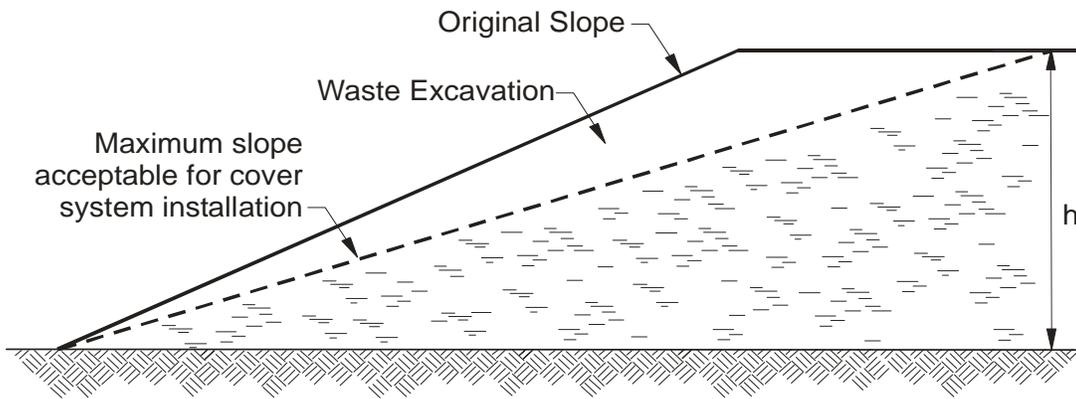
Waste Excavation Approach for Constructing Cover Systems Over Steep Waste Slopes.
